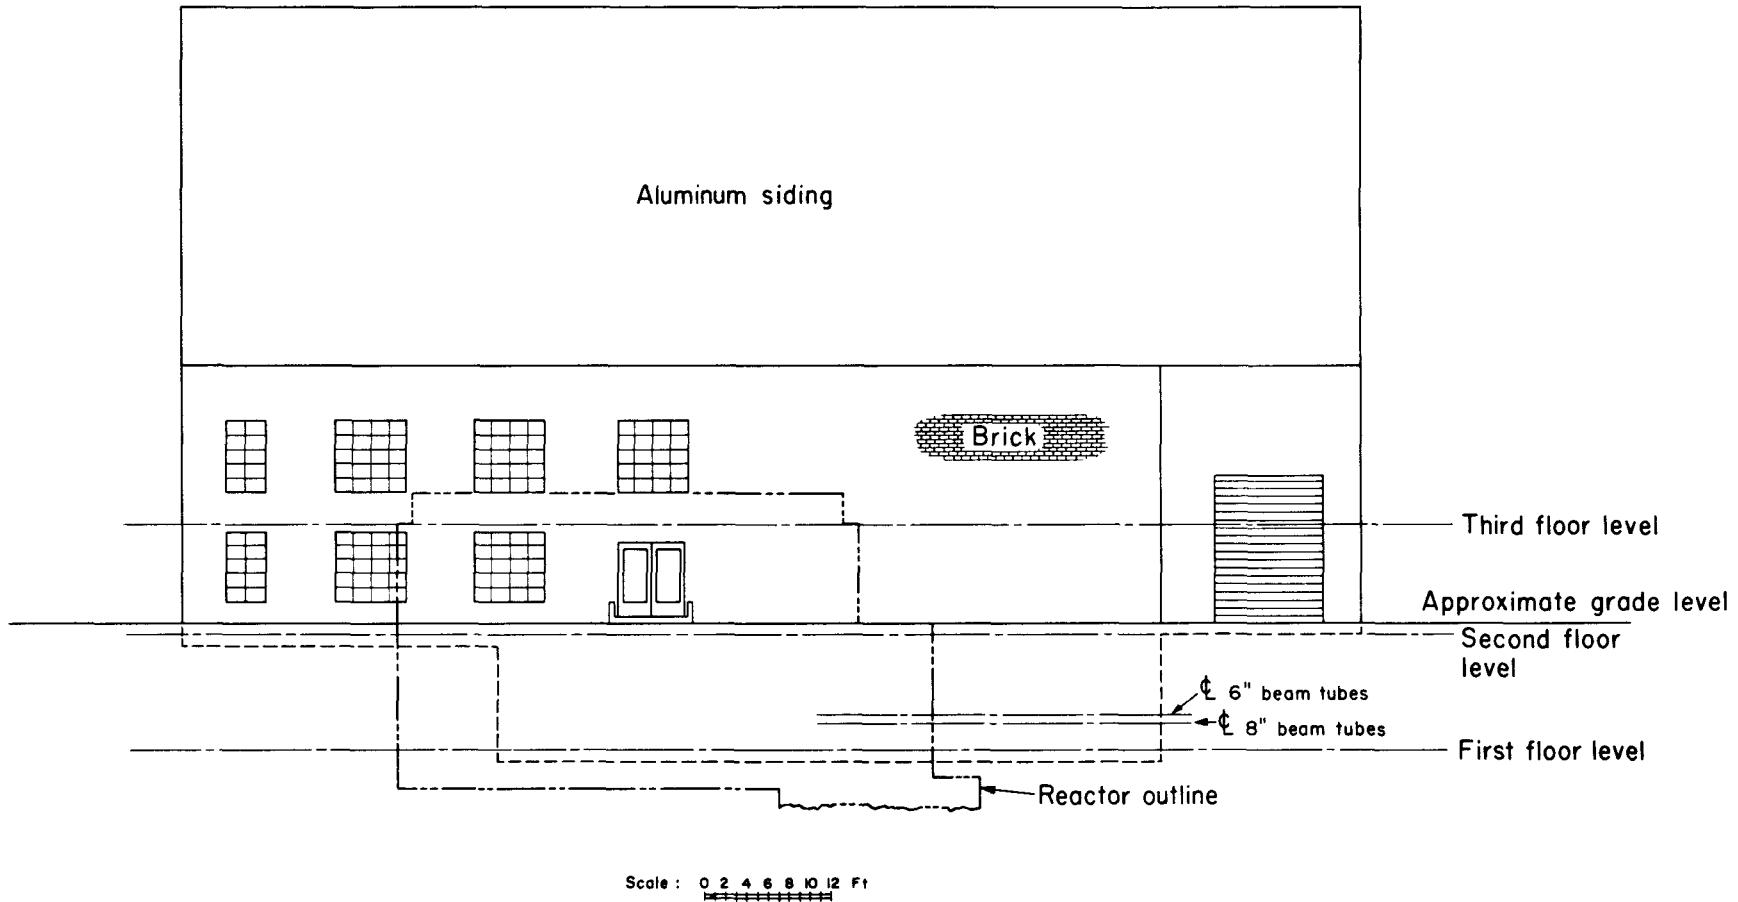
SAMPLE ELEVATION OF BUILDING
